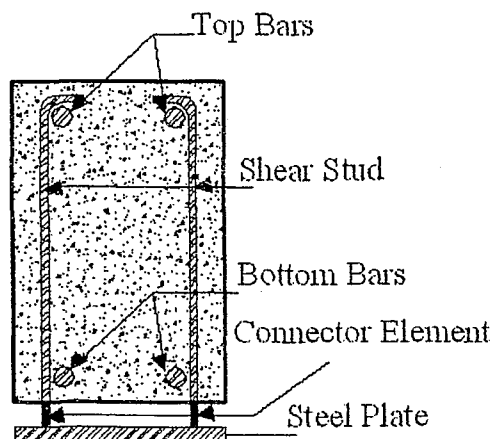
Cross-section of beam with Shear - Stud Model
